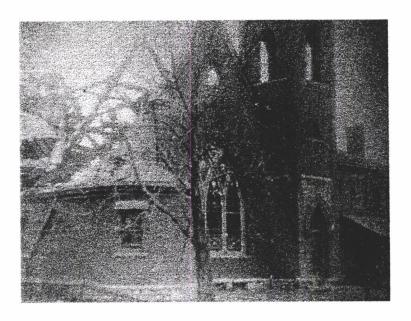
Fire Damaged Waterloo Baptist Church and Adjacent M'Clintock House, 1906
